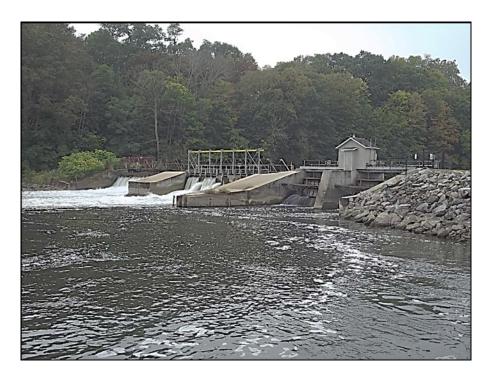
Upstream face of right embankment viewed from left Note that deterioration of the catwalk prevents access
